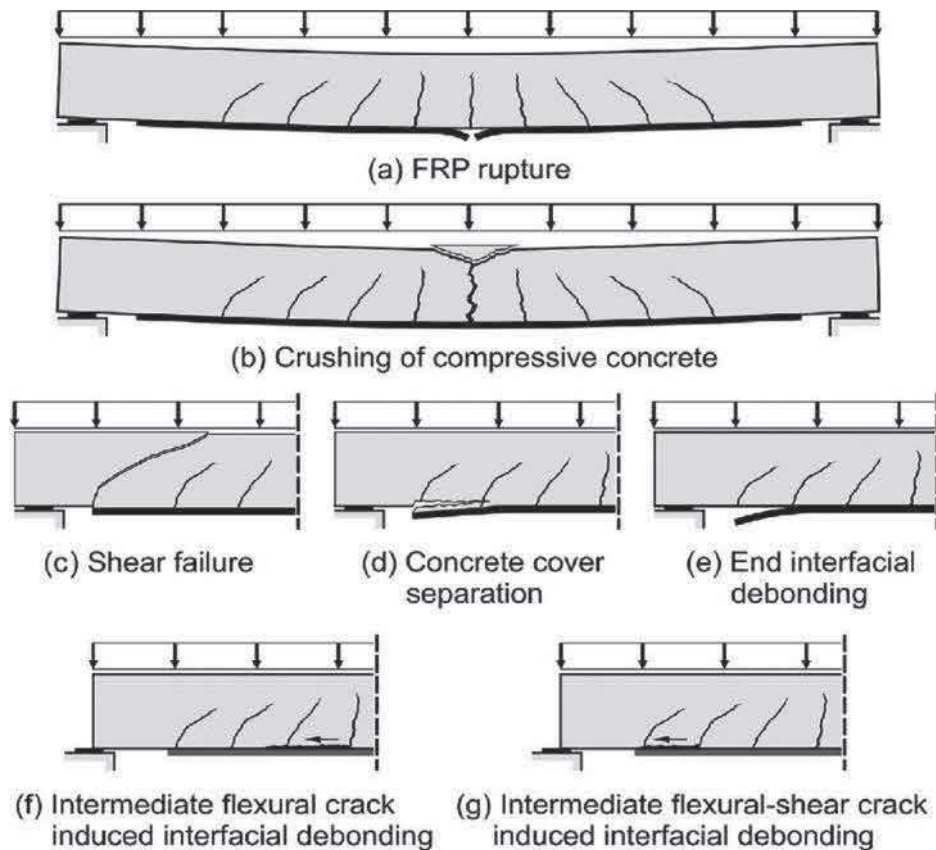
Failure modes of an FRP Plate-bonded RC beam. (Hind, M. Kh et al., 2016)
